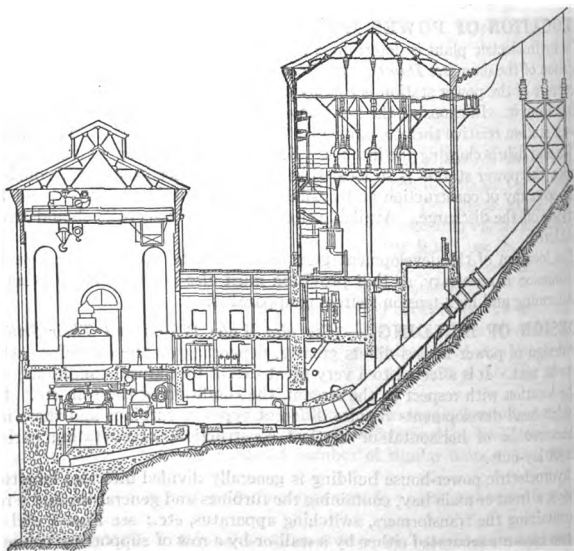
Cross Section of Power House; Roof Trusses with Raised Chord
